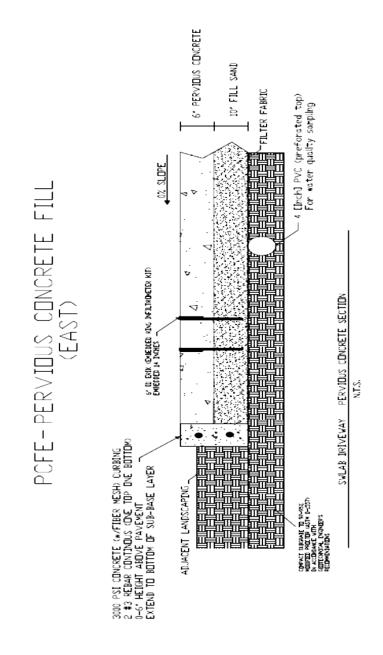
Cross-sectional view of Pervious Concrete Fill (PCF)
